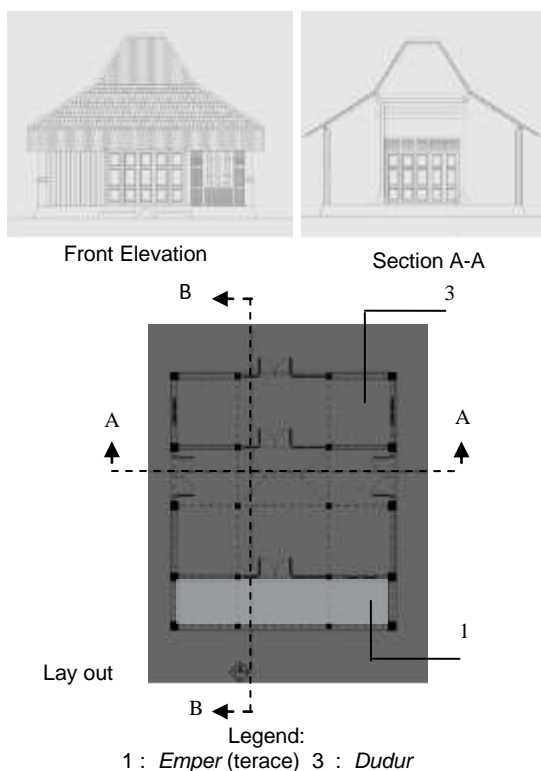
Lay out, Section and Elevation Of Omah Dudur Siji
